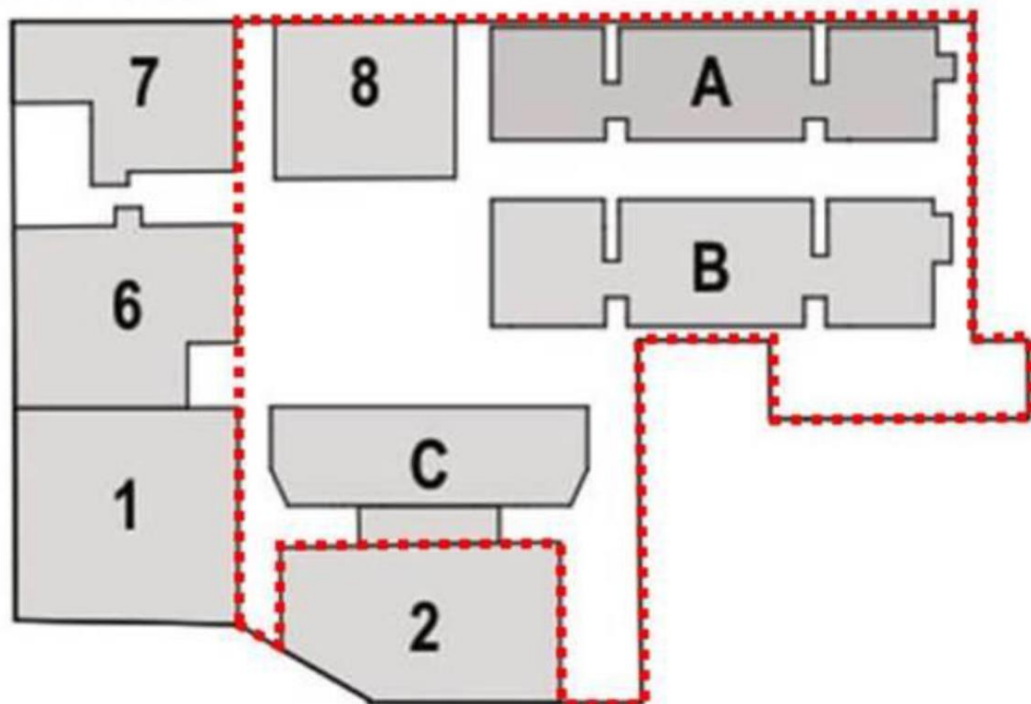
Site Plan for Precinct 75, showing buildings with proposed residential use circled in red
